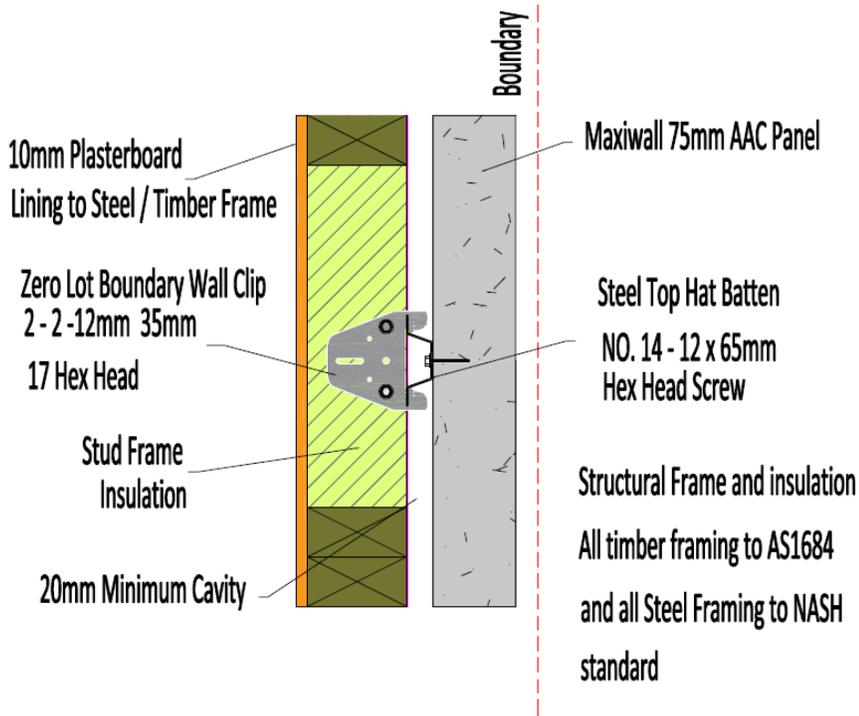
Maxiwall 75mm Zero Lot Boundary Walls
